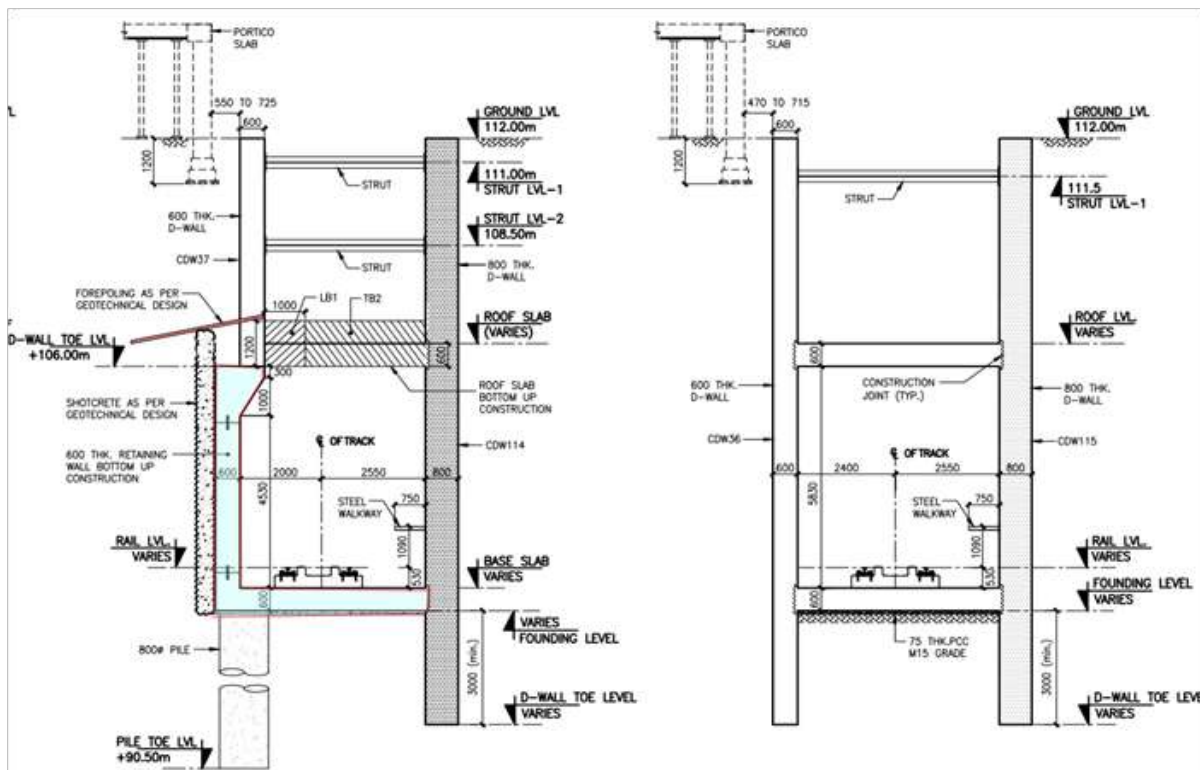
Cross Section showing the rearranged portion of cut & cover box tunnel (left side) and a typical portion of cut & cover box tunnel (right side).
